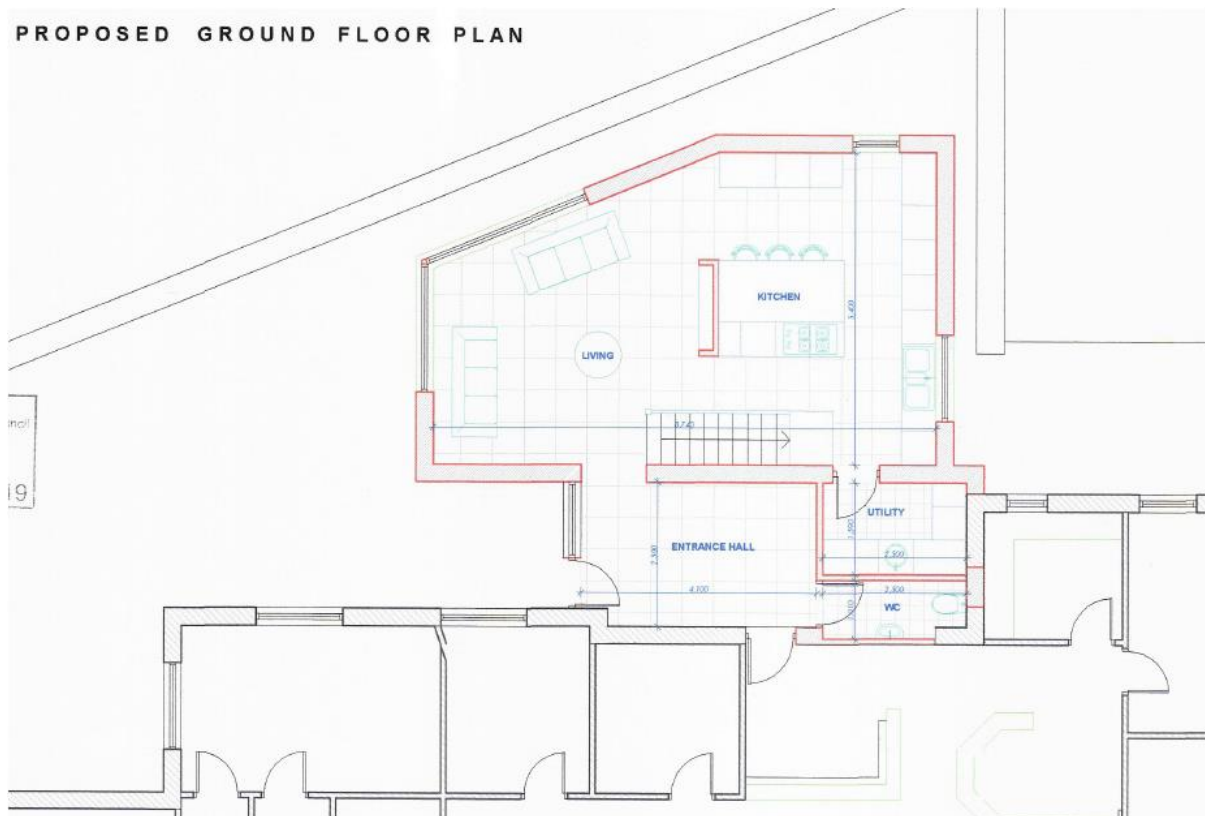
Proposed ground floor plan off existing business showing kitchen and living area and separate external access
